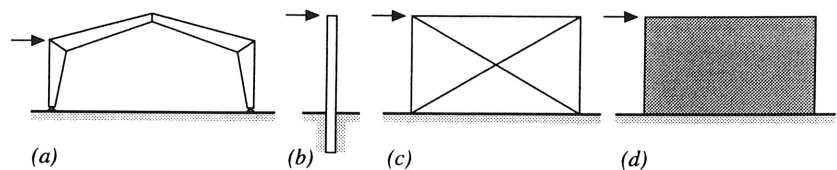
Vertical bracing elements, (a) frame, (b) cantilever, (c) diagonal bracing, (d) shear wall unit
